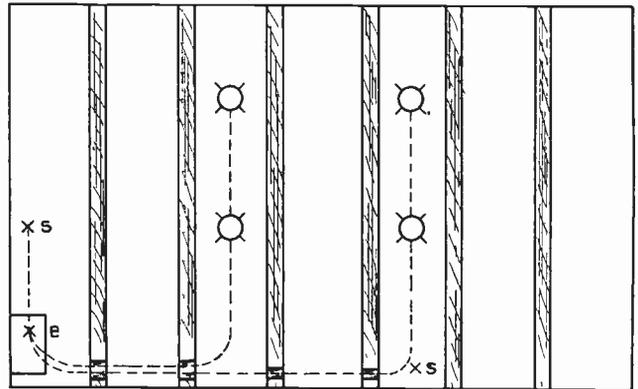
Ceiling joists should not be notched in their centers in order to run conduit by the shortest path to outlets. Instead the joists should be notched near walls or supports, and the conduit bent to run through these notches, and then back between the joists to the outlets as shown in this diagram.
